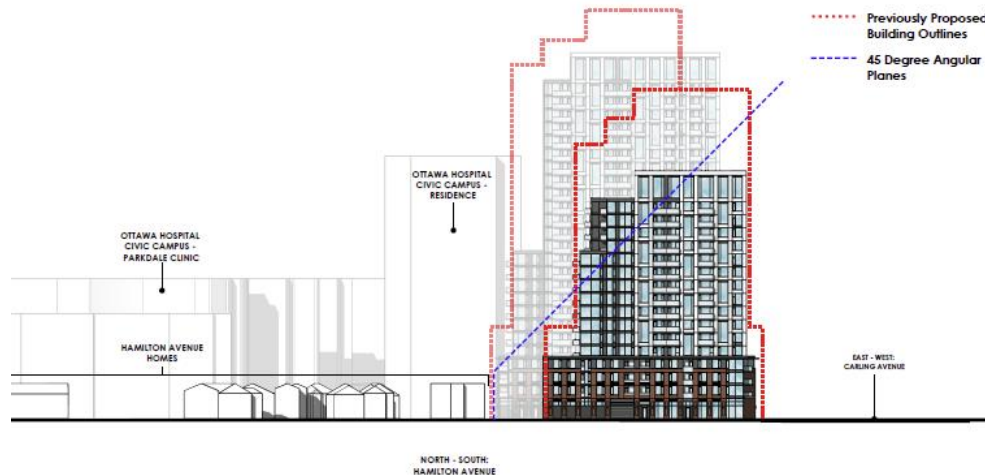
Rendering addressing the 45% angular plane and alternatives considered in determining the placement of buildings and their setback to reduce impact on the neighbouring residential area. The revised massing fits better within the 45-degree angular plane. The revised west building fits entirely within the angular plane. A similar series of drawings were prepared in determining the least intrusive massing arrangement with both one and two tower concepts. Hobin Architecture 2022.
